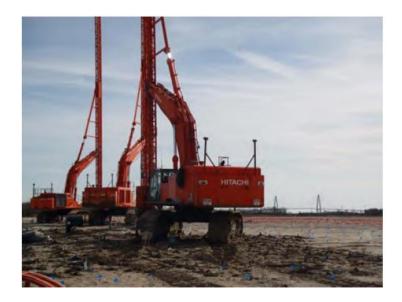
Installation of PVD at the container site (Goldberg 2013)
